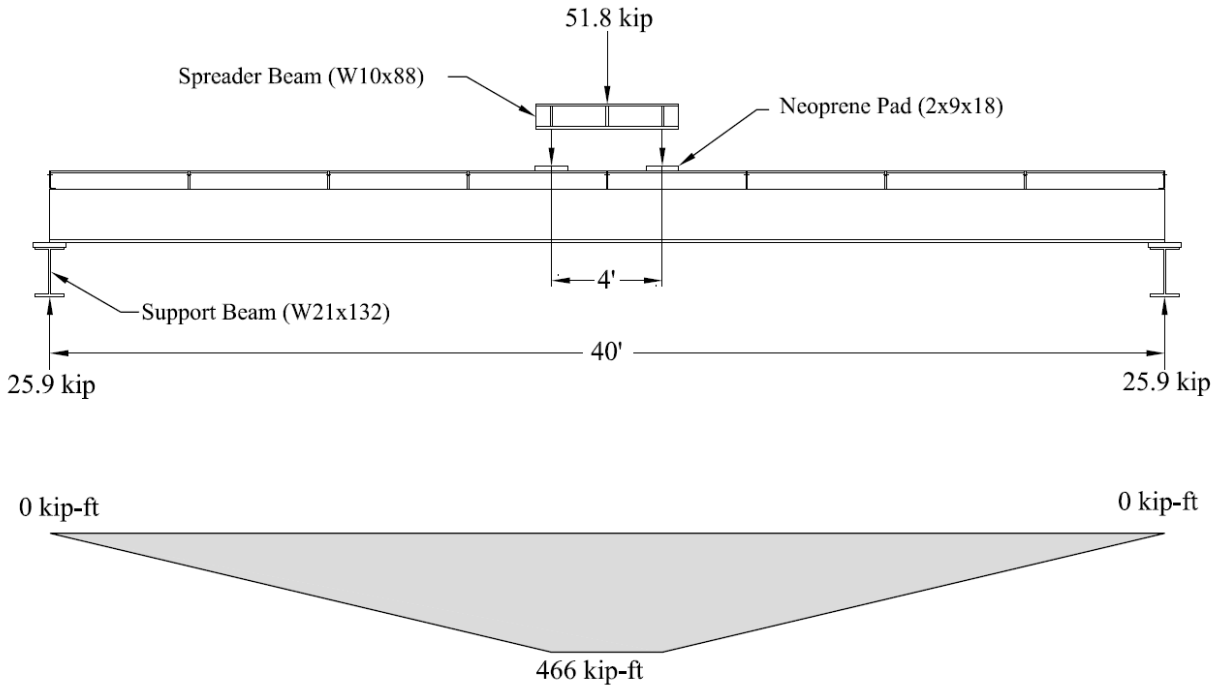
Test setup with two point loads for each girder and corresponding moment
